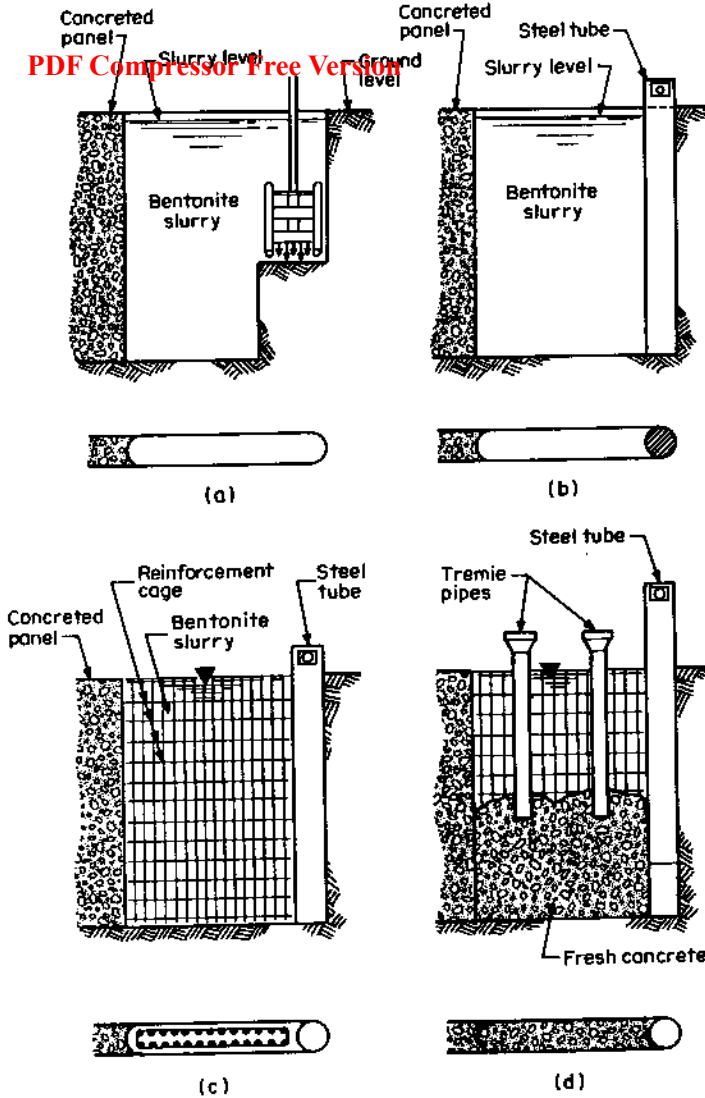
Typical construction sequence of a diaphragm wall executed in four stages: a) excavation; b) insertion of steel tubing; c) placement of reinforcement cage; d) concrete placement (Xanthakos 1979).
